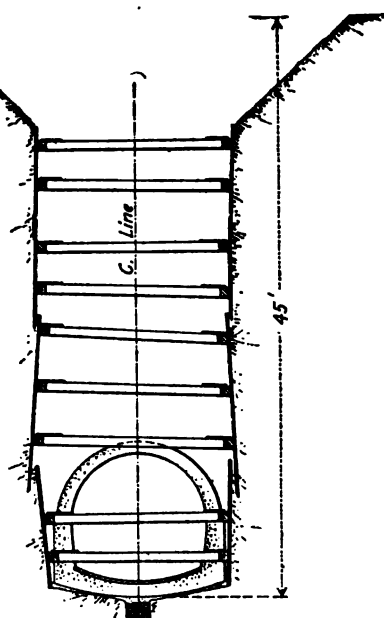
Trench supported by poling boards with single sets of rangers and braces, for sewer 10 ft. 1- $\frac{1}{4}$ -in. × 10 ft. 7 in.
